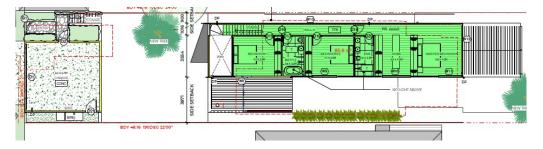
Previously approved gross floor area under DA2020/1784 shown in green - first floor.
